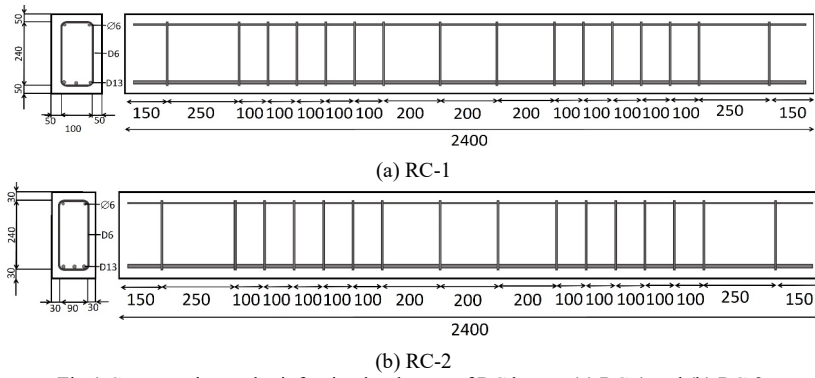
Cross section and reinforcing bar layout of RC beams (a) RC-1 and (b) RC-2.
